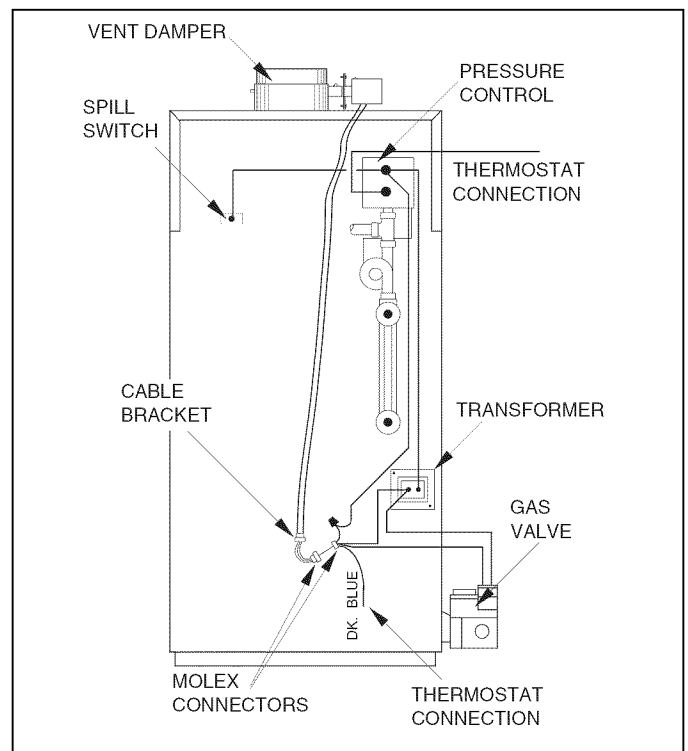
VENT DAMPER INSTALLATION FOR STANDING PILOT
